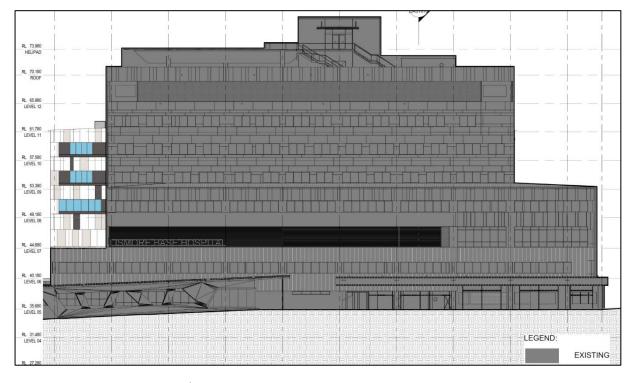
| SSD-8963 Approved south elevation (Base source: SSD-8963)
